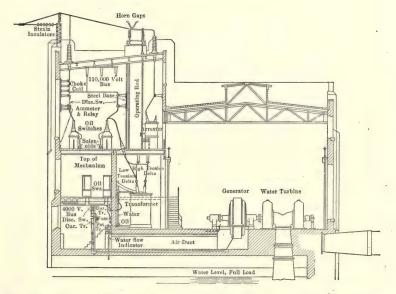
Sectional View of Power-house Arrangement. Mexican Northern Power Company. (For floor plan see Fig. 98a.)
